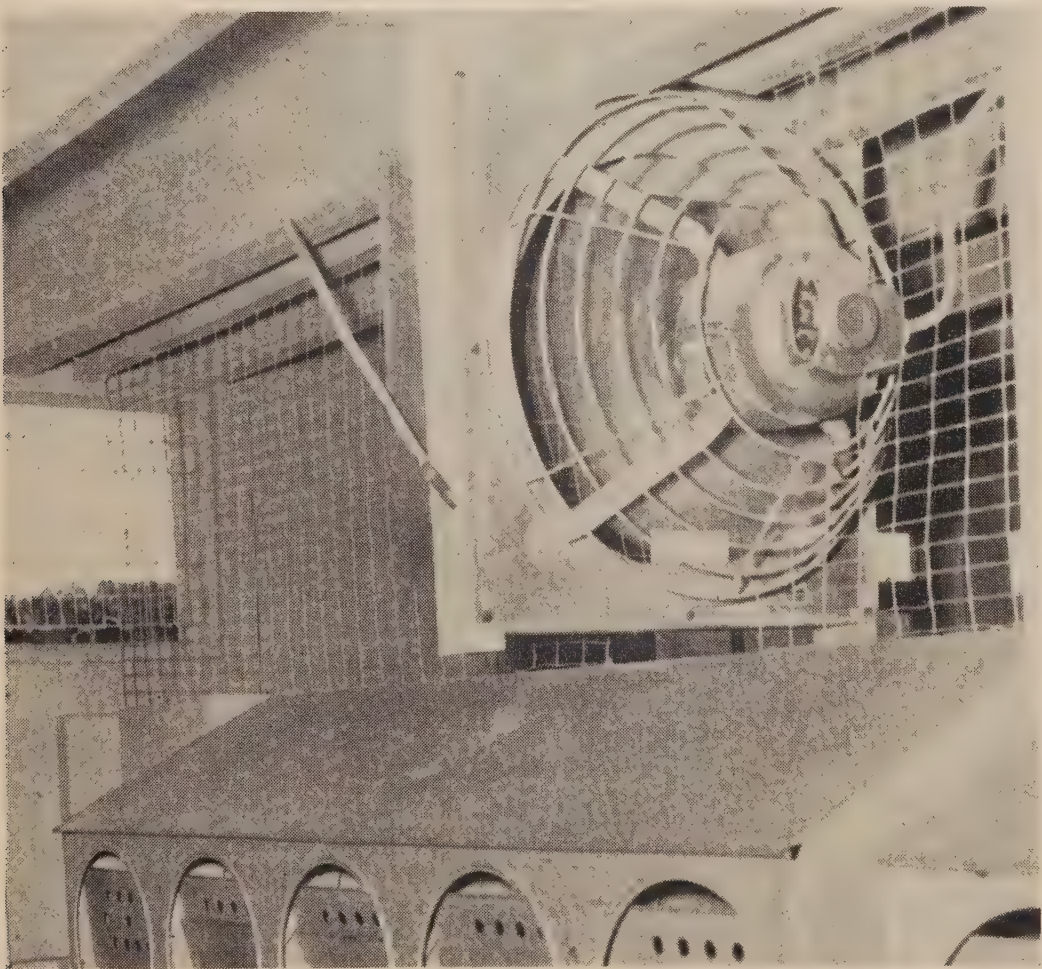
View of fan installed over double pen partition and facing the sliding wall outlet.
